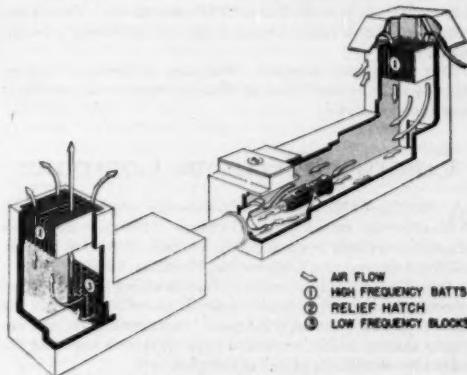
CUTAWAY DRAWING OF TURBOJET-ENGINE TEST CELL SHOWS THE AIR FLOW AND THE SYSTEM OF BLOCKS AND GRIDLIKE "BANTS" DESIGNED TO LOWER THE SOUND LEVEL OF ENGINES UNDER TEST.
